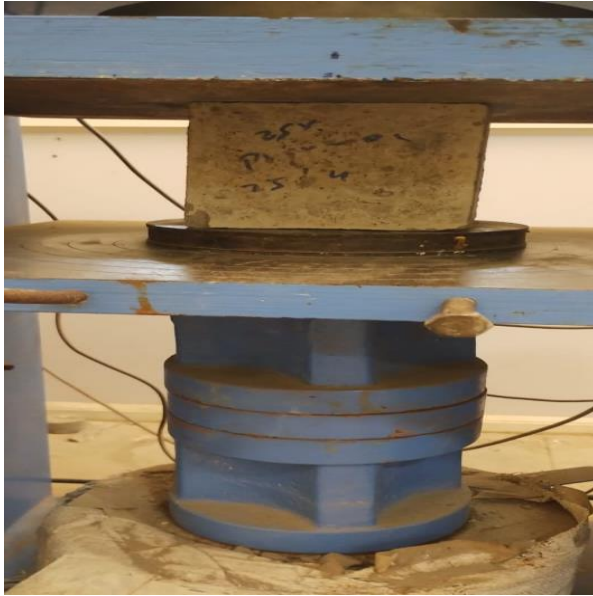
Crushing of concrete beam specimen using the compression testing machine
